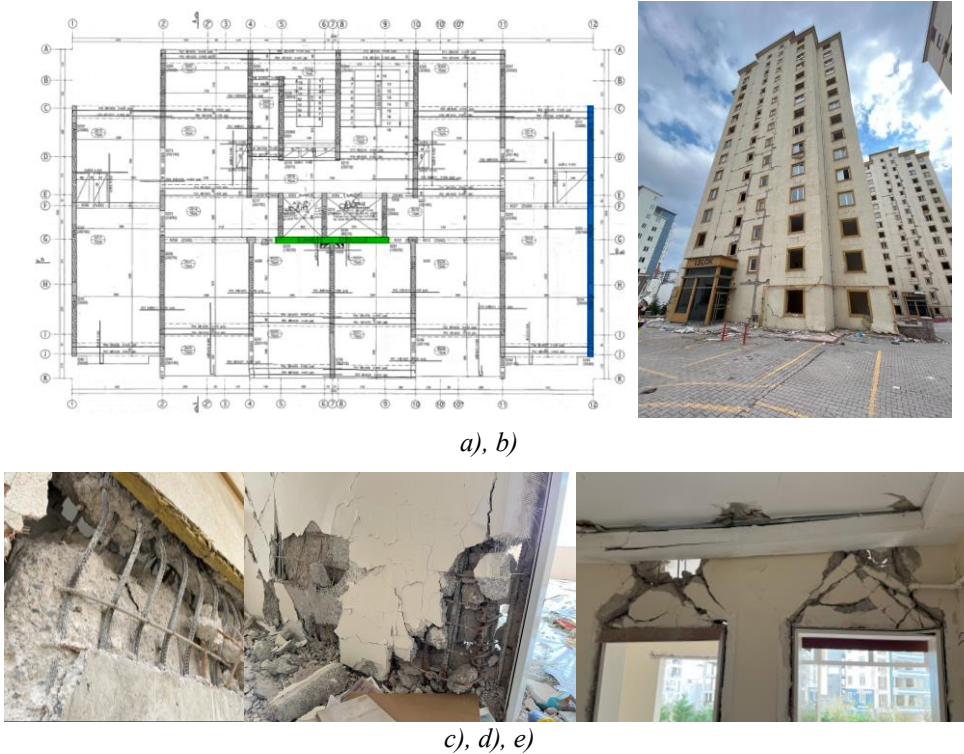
Case study building: a) typical floor plan; b) exterior view; c, d, e) representative earthquake induced damage [3]
